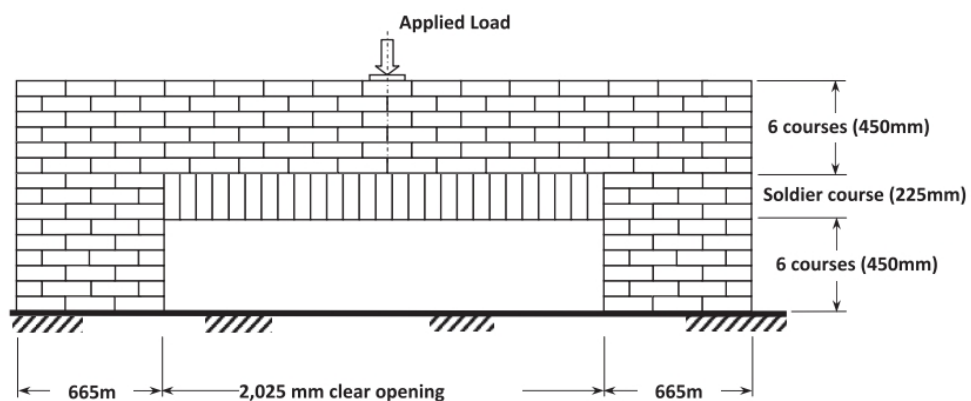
Profile of masonry wall (Giamundo et al., 2014)
